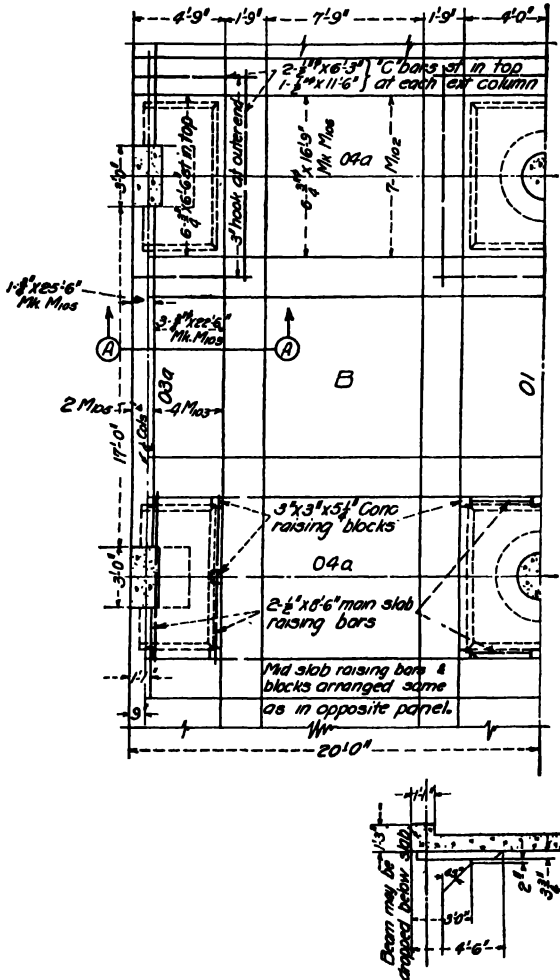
Exterior panel with combined raised beam and slab spandrel.
